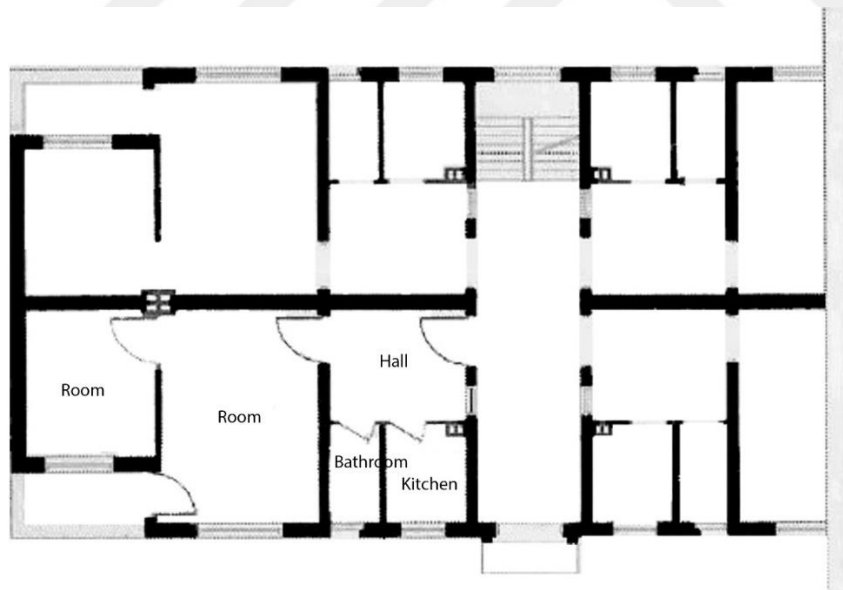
21. Civil Servant Houses Plan (Reordering by Merve Köz, original plans from Doğan, 2009, p. 94).
